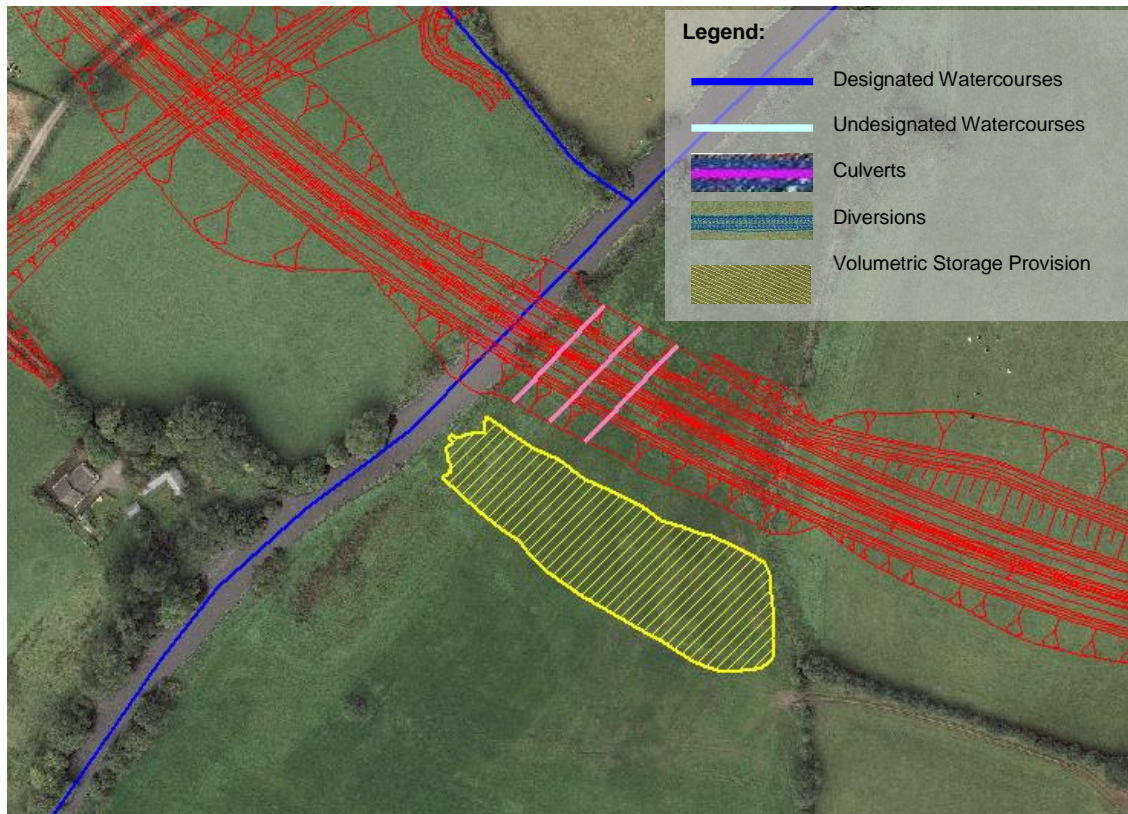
Model M.6 Plan of Drumragh River Volumetric Floodplain Storage Provision (S2-CS-13)
